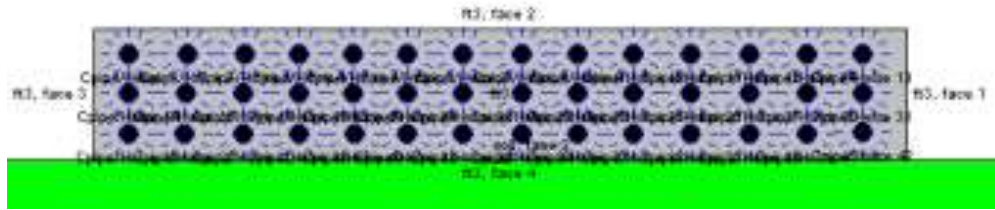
4C drawn layout of cooling pipes for pier 3 footing recommended by CTL Group
